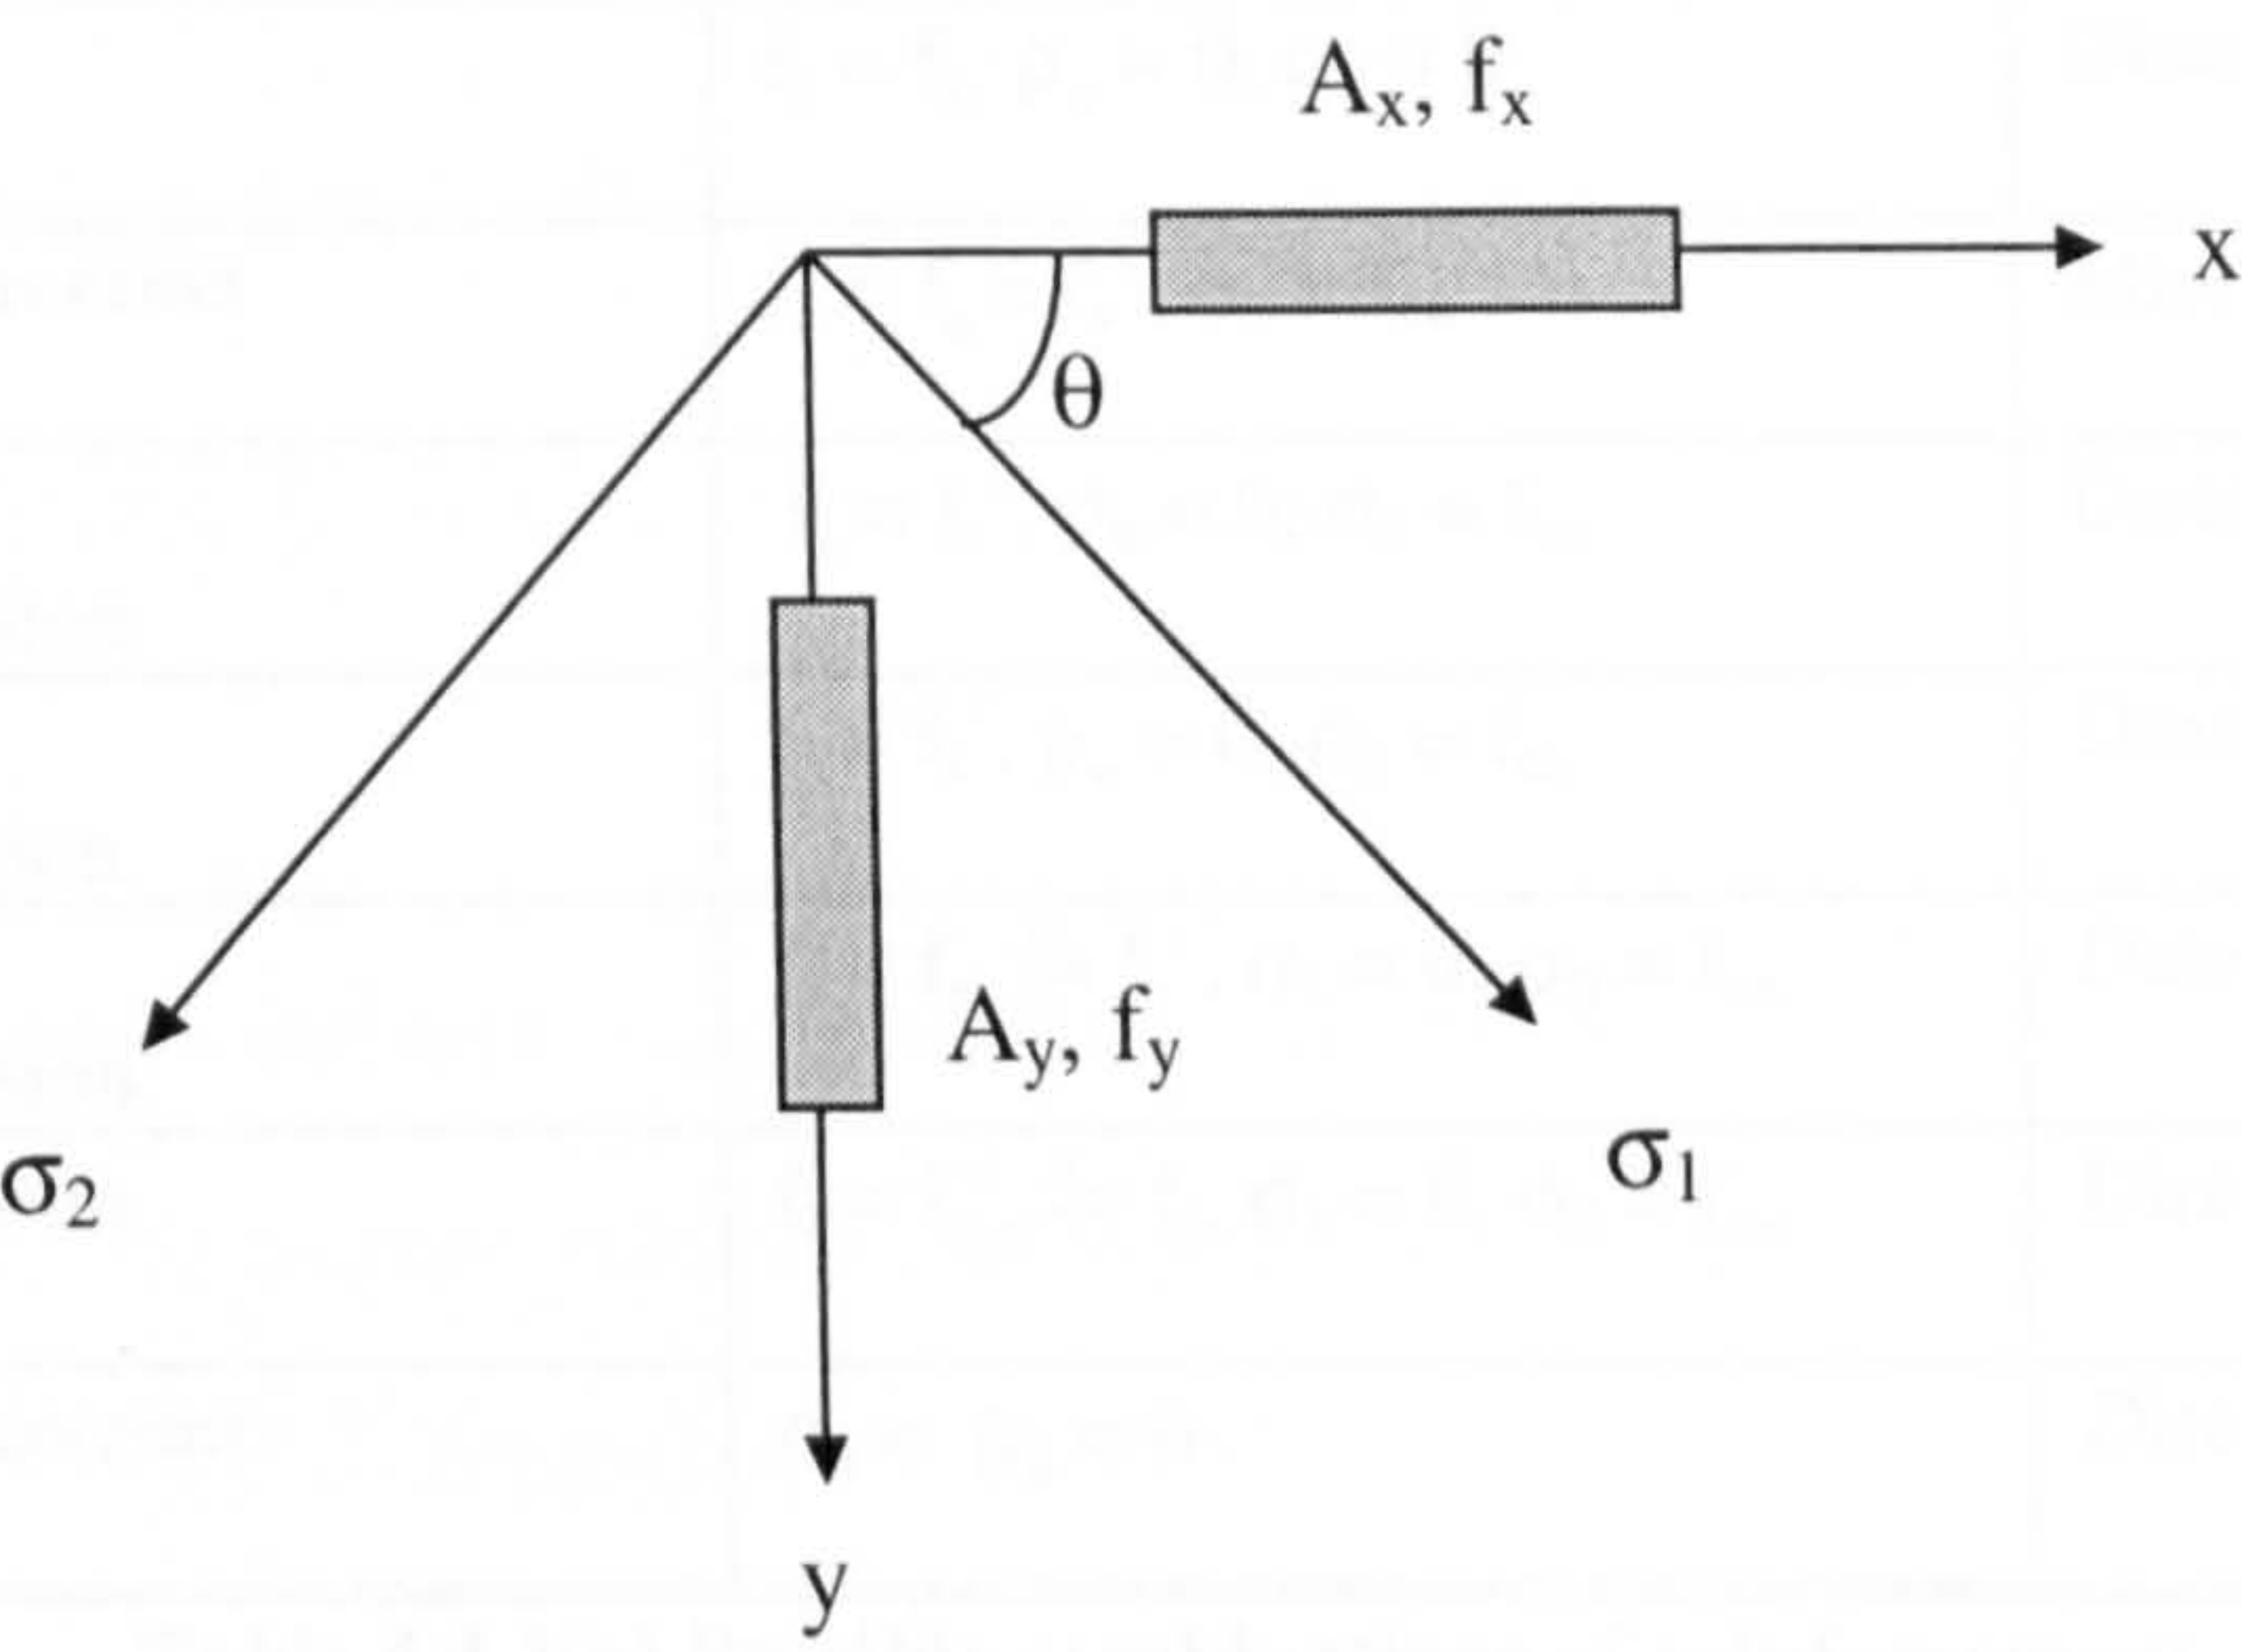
(a) Principal Concrete Stresses and Reinforcement Directions
